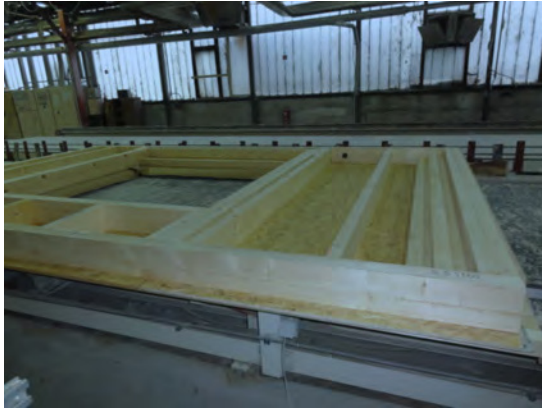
Factory manufacturing of prefabricated timber-frame walls.
